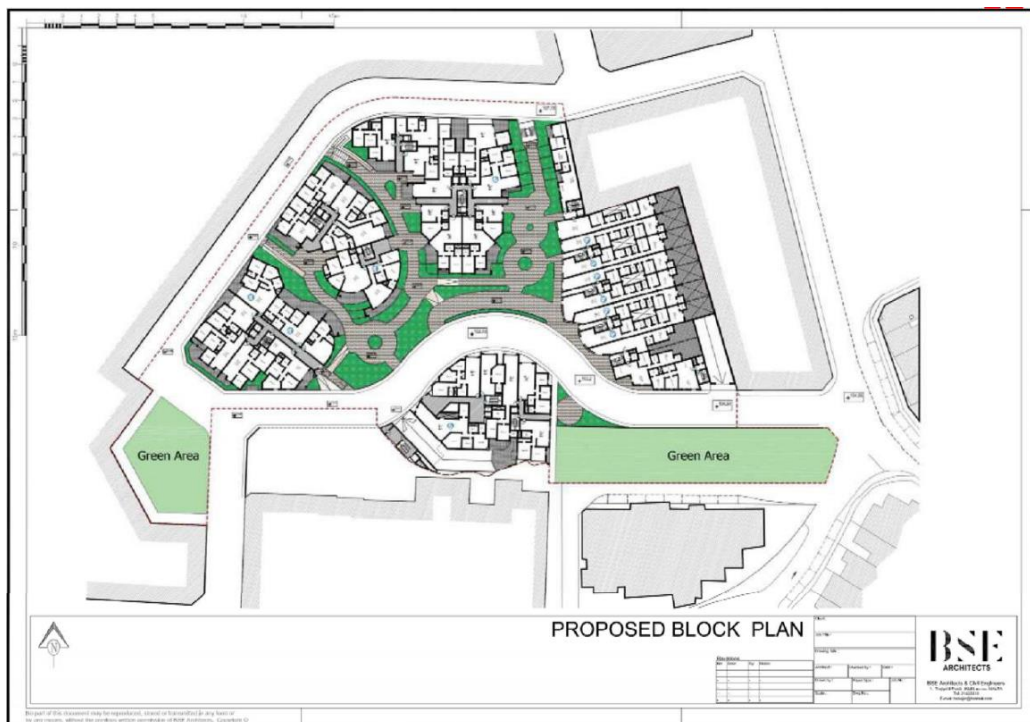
Proposed block plan with landscaping (Source: PDS)
